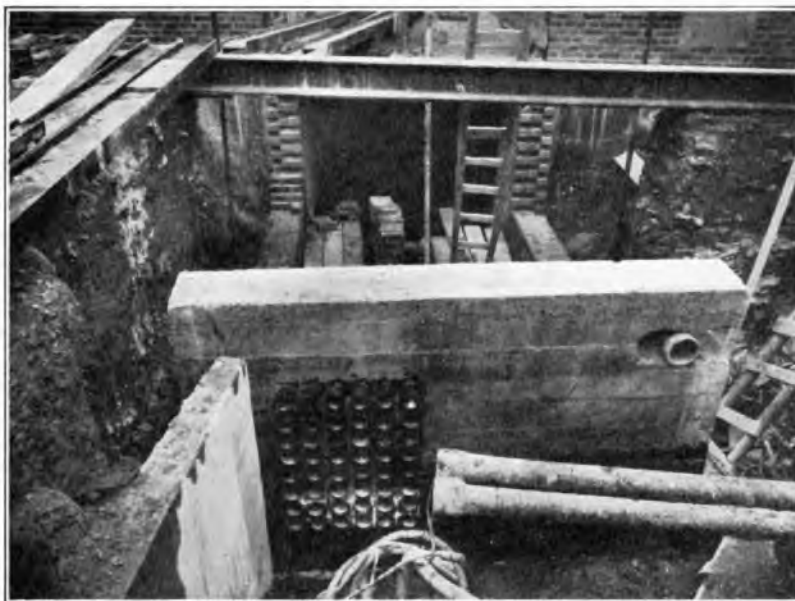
VIEW LOOKING TOWARDS THE EXCHANGE PRIOR TO CONSTRUCTION OF GREASE CHAMBER.
